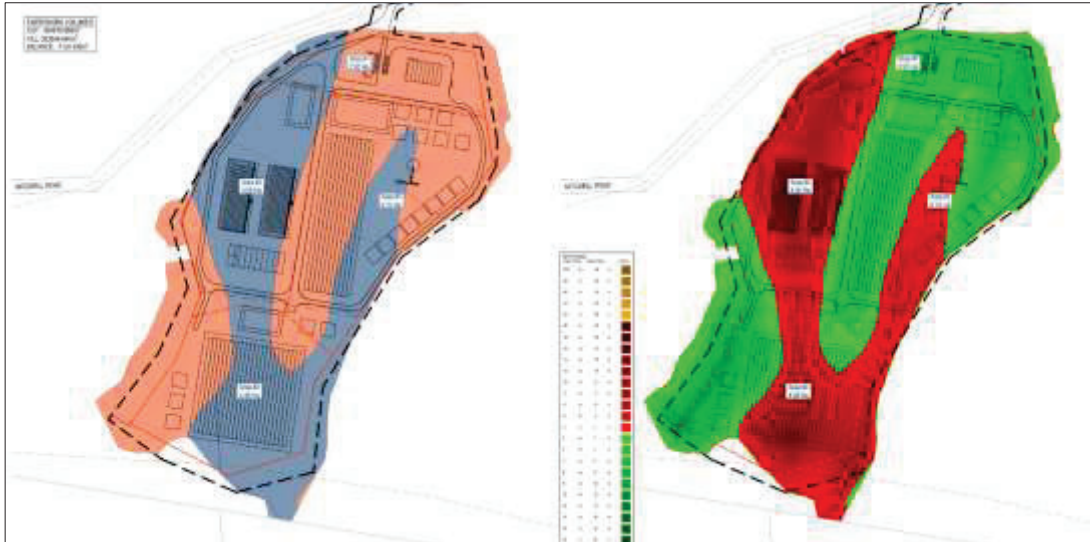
Layout and cut-fill plan of proposed development (provided by Client)
